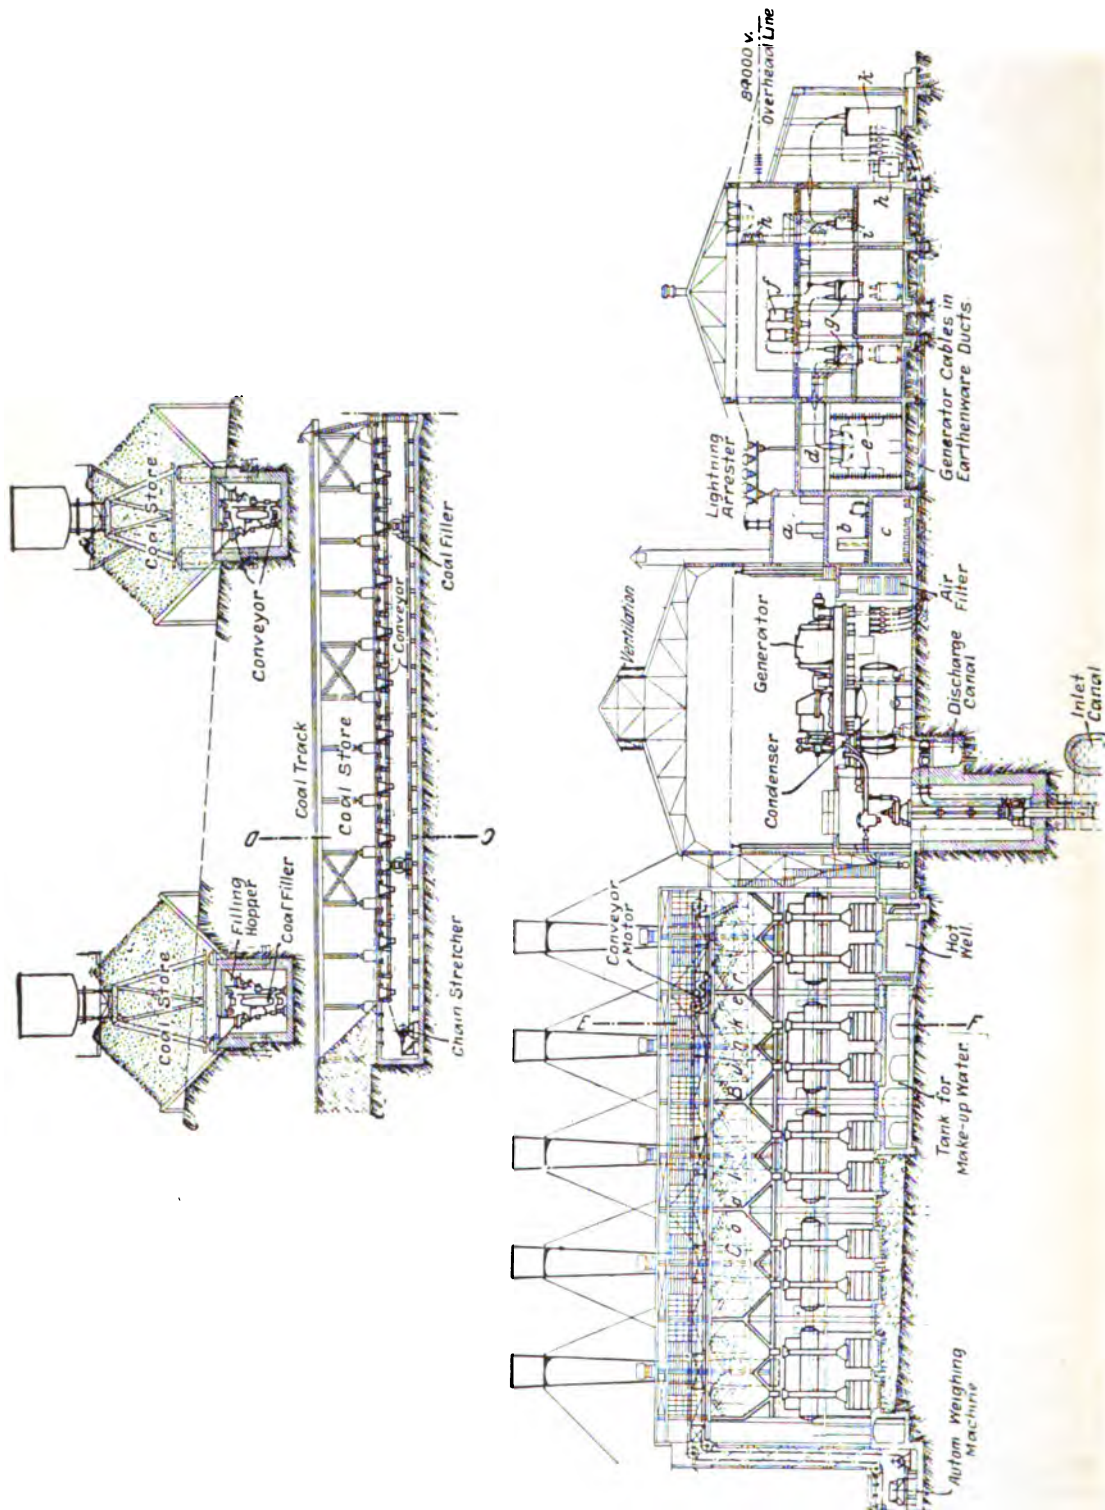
Vereeniging Power Station. Section through Coal Conveyor Plant. Boiler House, Engine Room, and Switch House.
